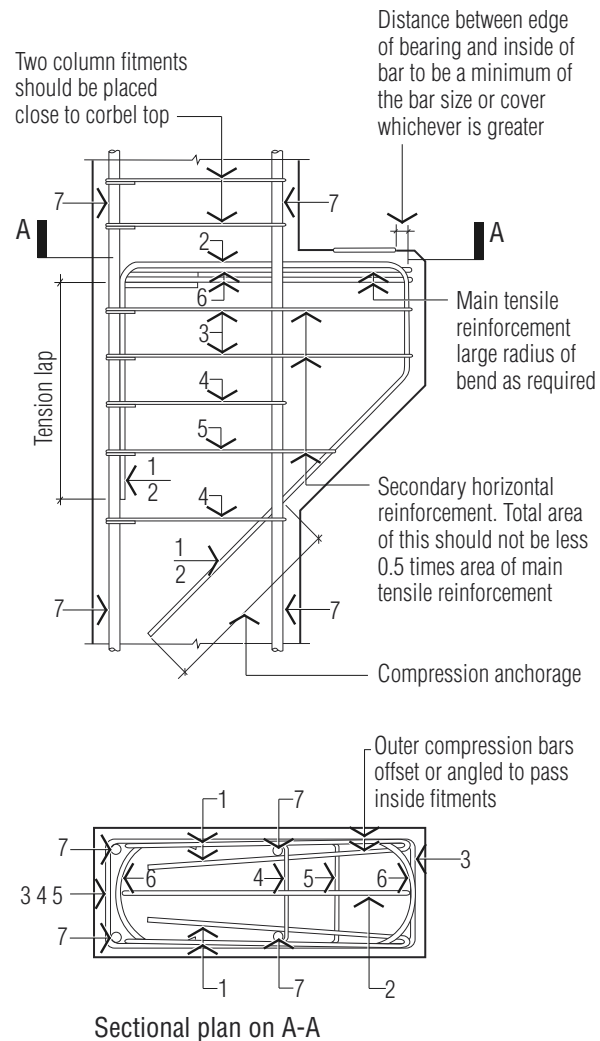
Detailing of a corbel to a column (after IStructE *Standard method of detailing structural concrete*)
